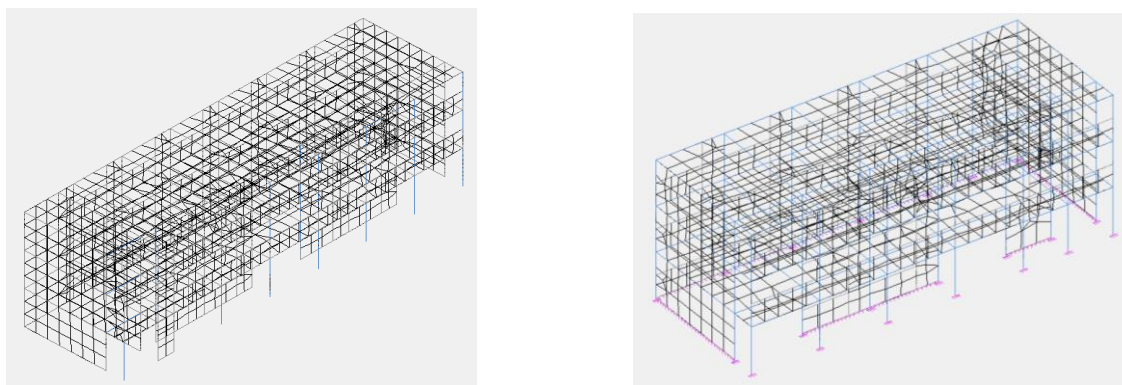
Model of the building : Left : west part of the building (1851 nodes – 204 linear elements – 139 surface elements) – Right : east part of the building (1413 nodes – 156 linear elements – 102 surface elements)
